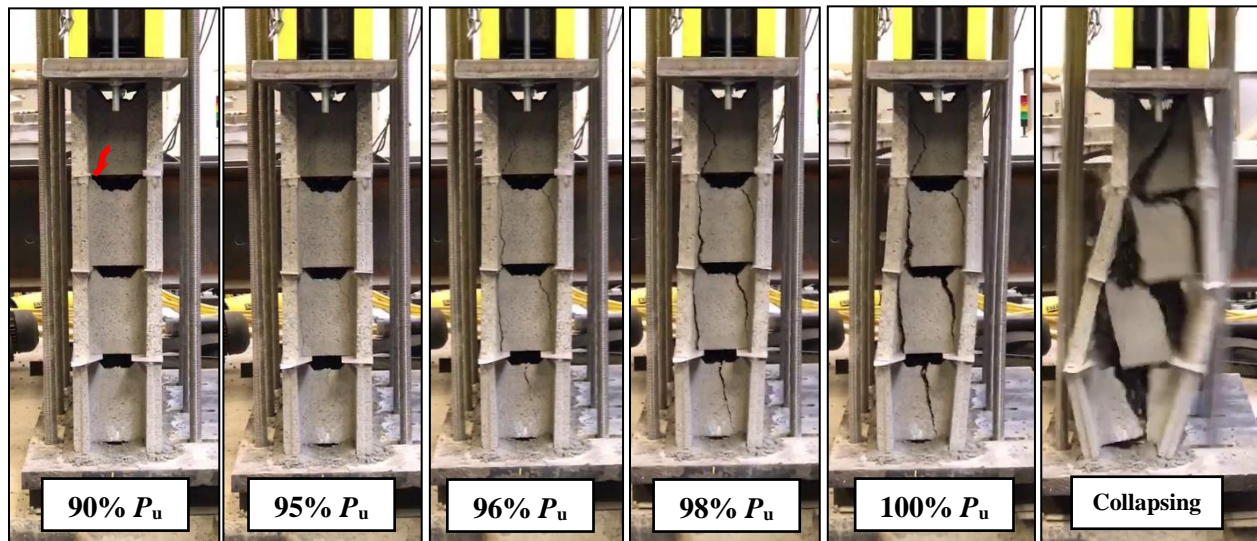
Failure mechanism of a dry-stacked masonry wallet [121]
